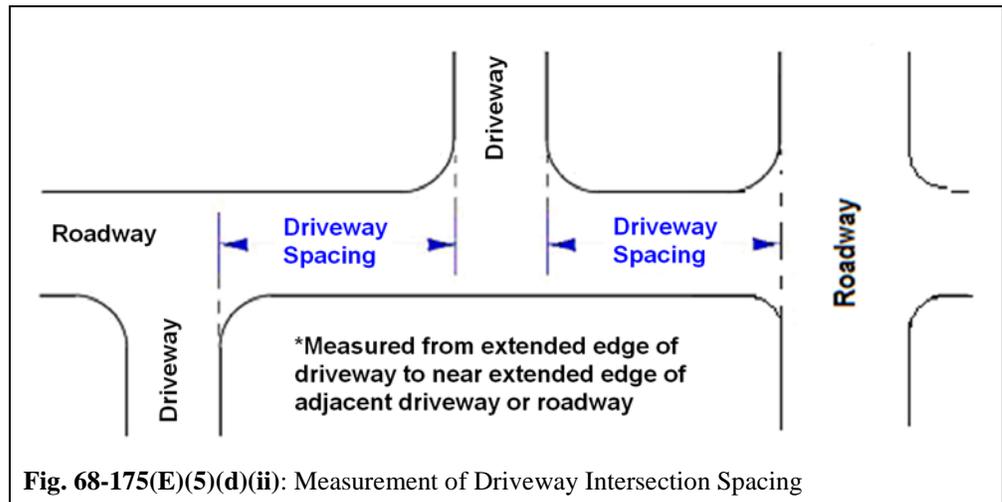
(E)(5)(d)(ii): Measurement of Driveway Intersection Spacing
